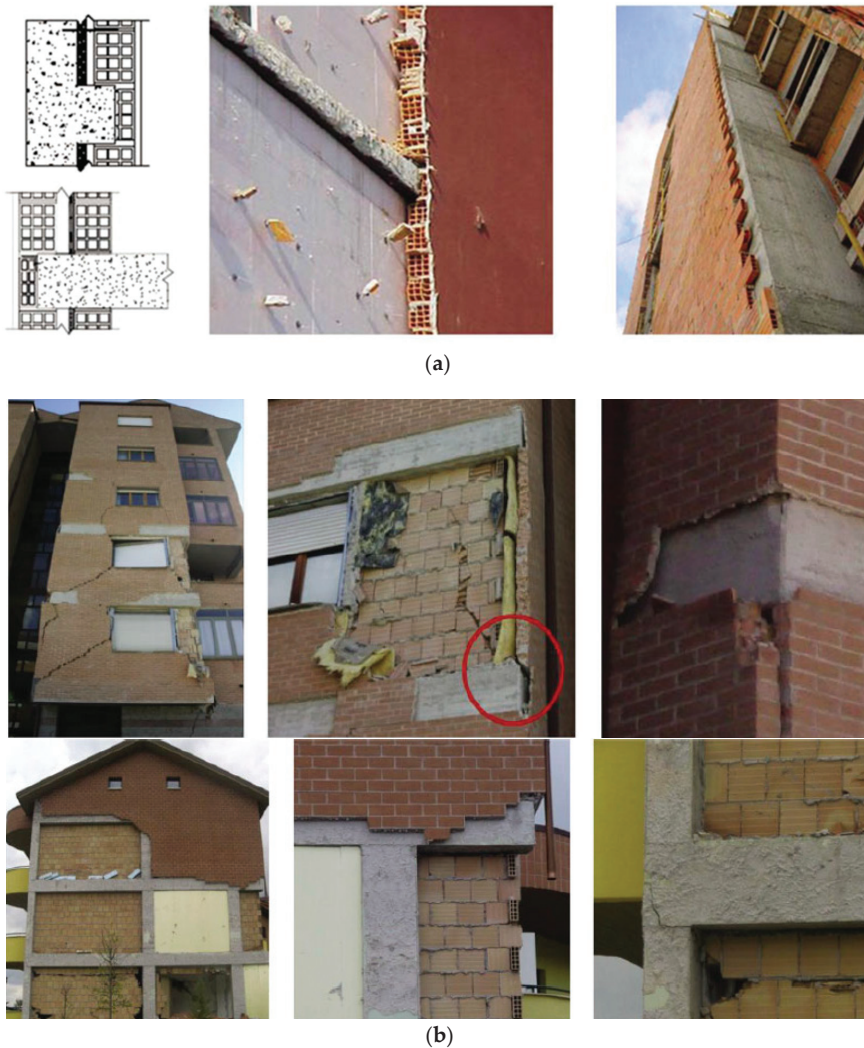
Examples of severe mechanical pathologies as consequence of: (a) inadequate correction of thermal bridges, using partially supported infill walls; (b) cracking and out of plane collapse of outer leaf of double-leaf cavity walls and veneer cladding walls [7].
